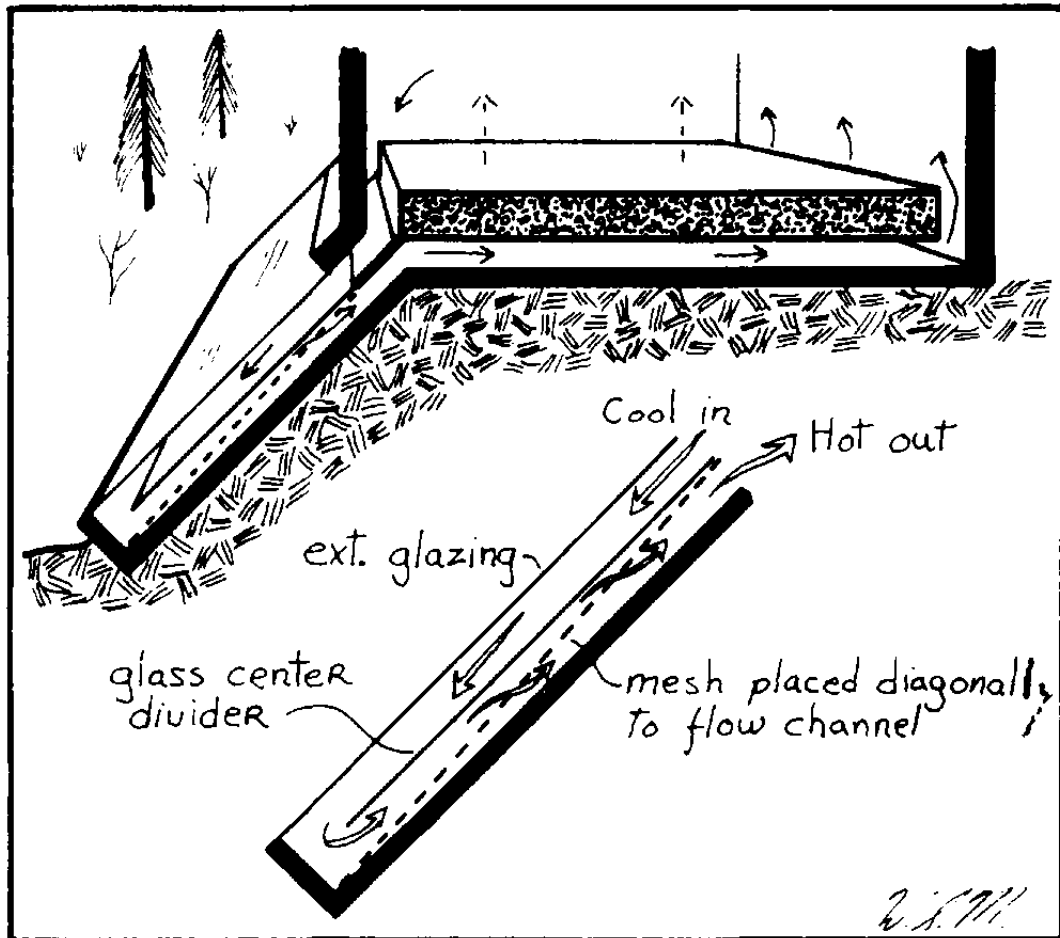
Center-glazed collector with masonry floor heat storage (MOR-1).
